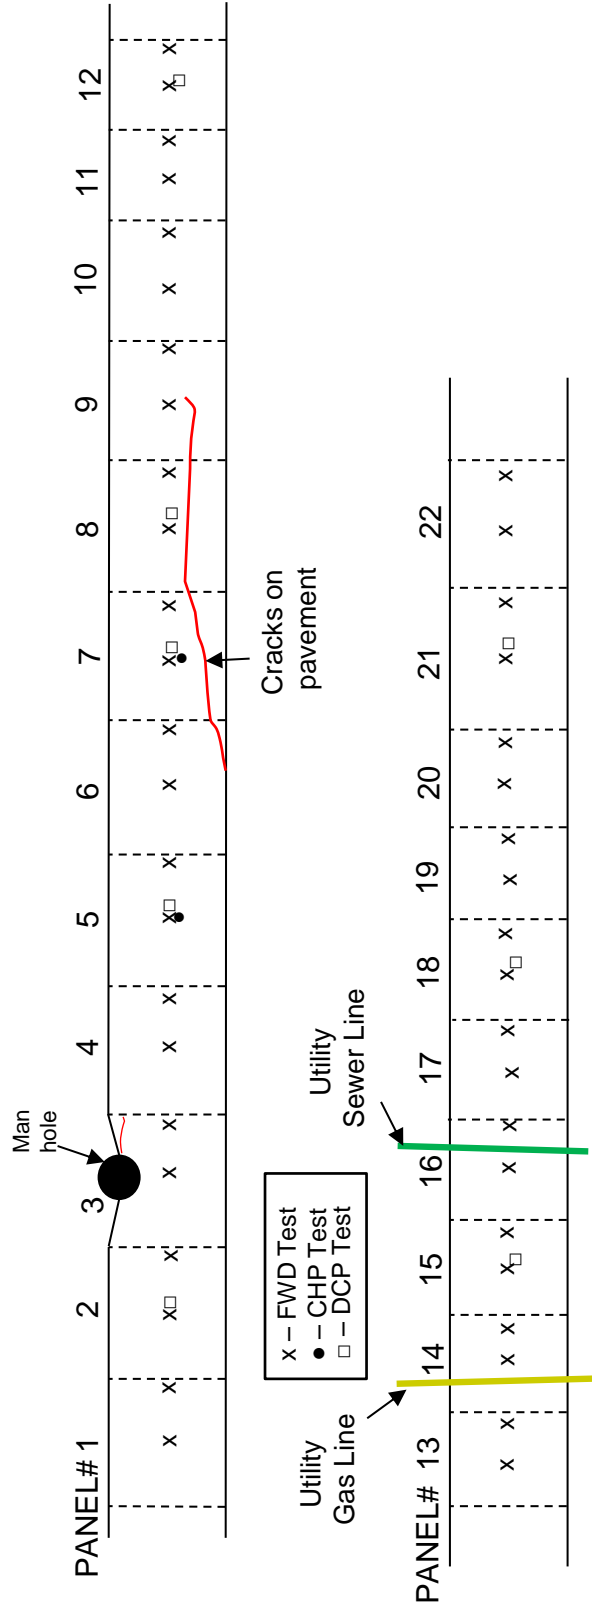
Crack Survey Map — South 5th Street, Knoxville
